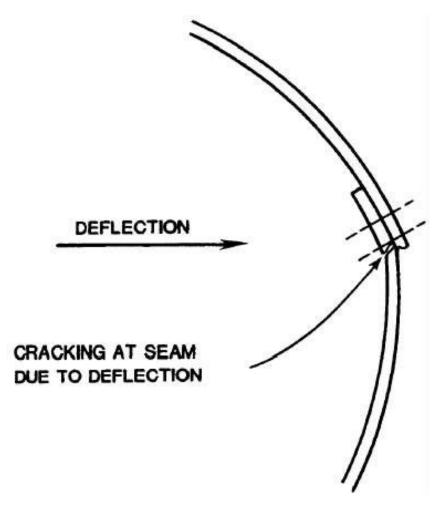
(Exhibit 71) Cracking Due to Deflection
